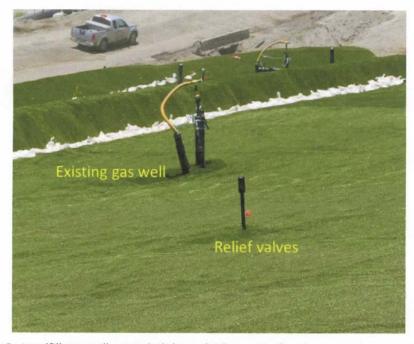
Landfill gas well extended through Closure Turf and gas vent to prevent uplift
